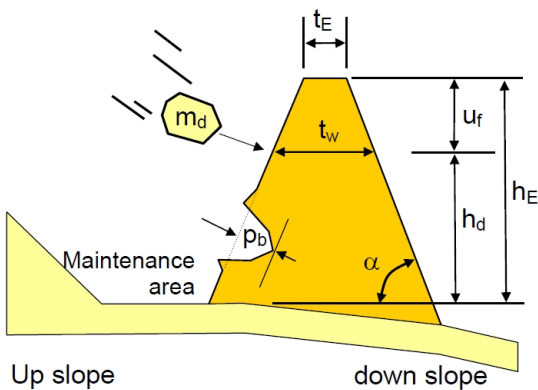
Indicative embankment layout and definition of the relevant embankment parameters
